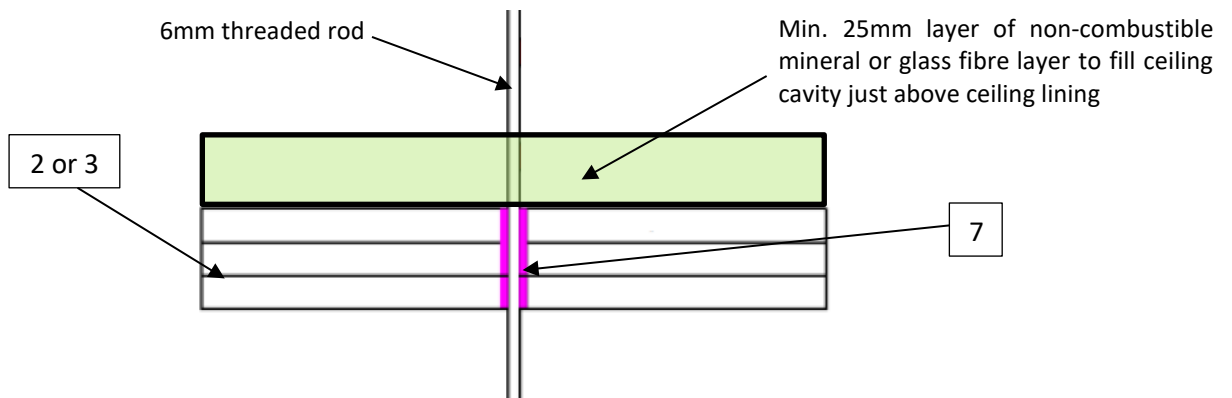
Additional sealant and ceiling insulation protection for floor-ceiling system with a false ceiling beneath
